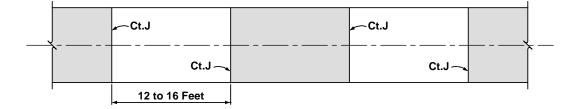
Concrete placement for a reinforced cast-in-place conduit.
